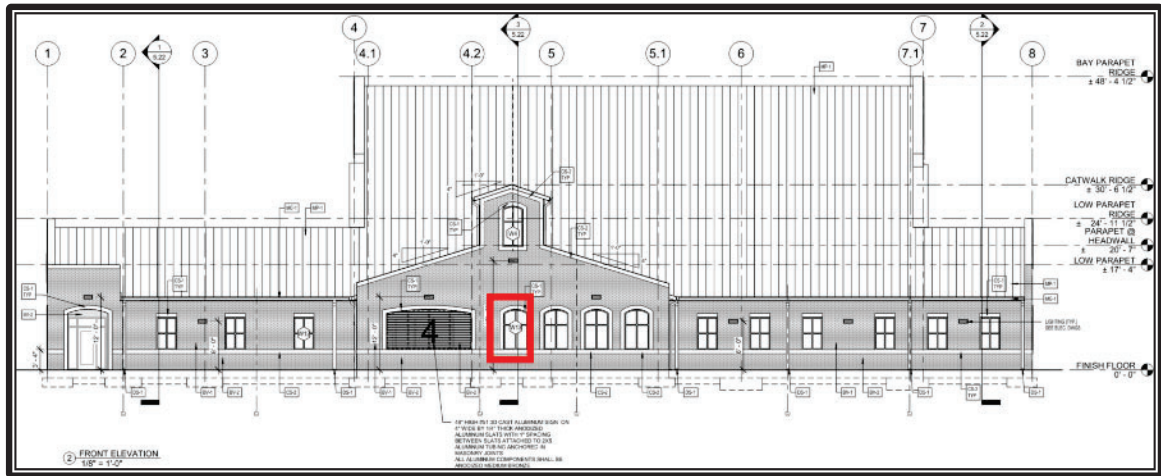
South exterior wall elevation showing the approximate location of Test Area 3 (outlined) (cropped plan courtesy of SCNA).
